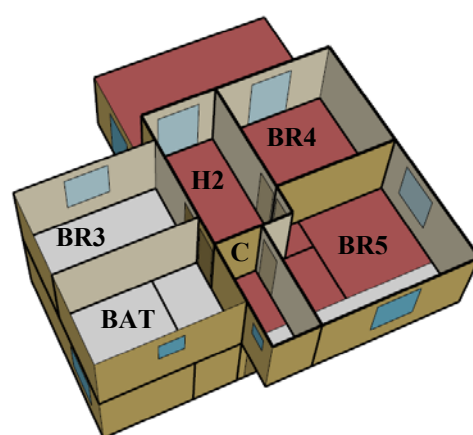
Arrangement of the rooms on the first floor (H2 – hall 2, C – closet, BAT – bathroom, BR3 – bedroom 3, BR4 – bedroom 4, BR5 – bedroom 5).
